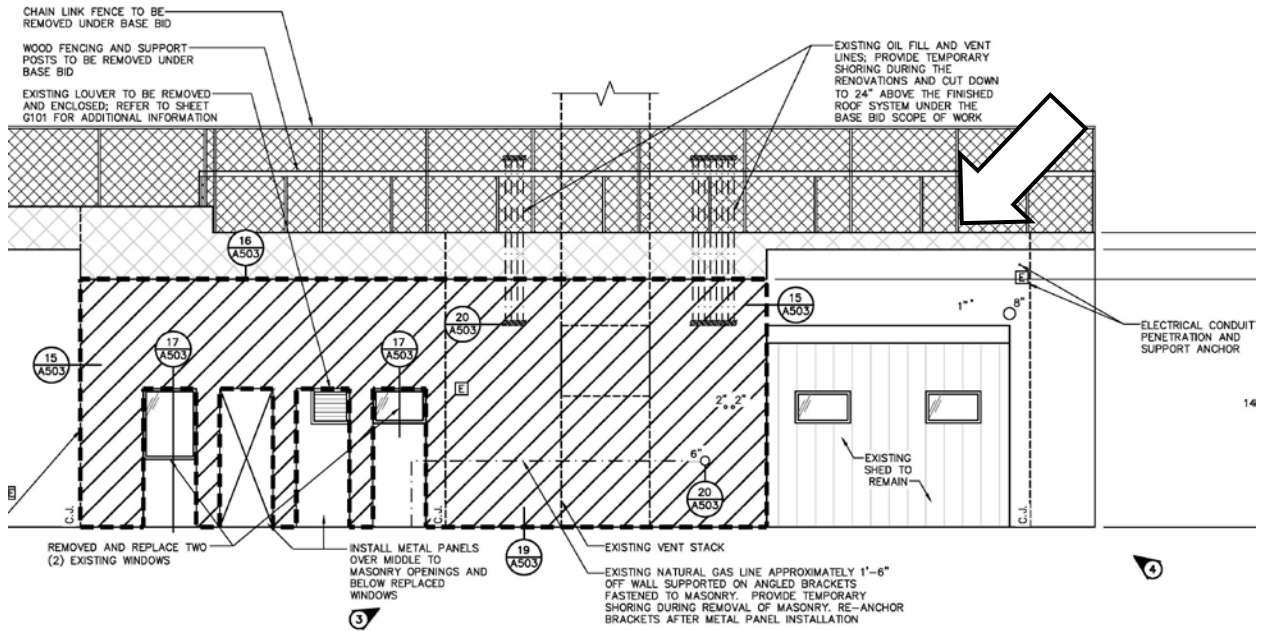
Image B – West elevation. The net hatch references the area to be demolished to complete the roof replacement project; the arrow represents the initial area of concern.
